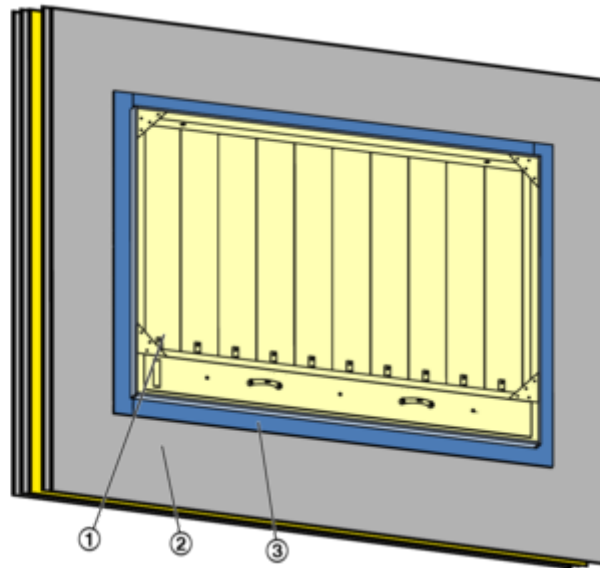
Installation example EK-JZ dry mortarless installation in lightweight partition wall with planking on both sides EI 120 S
